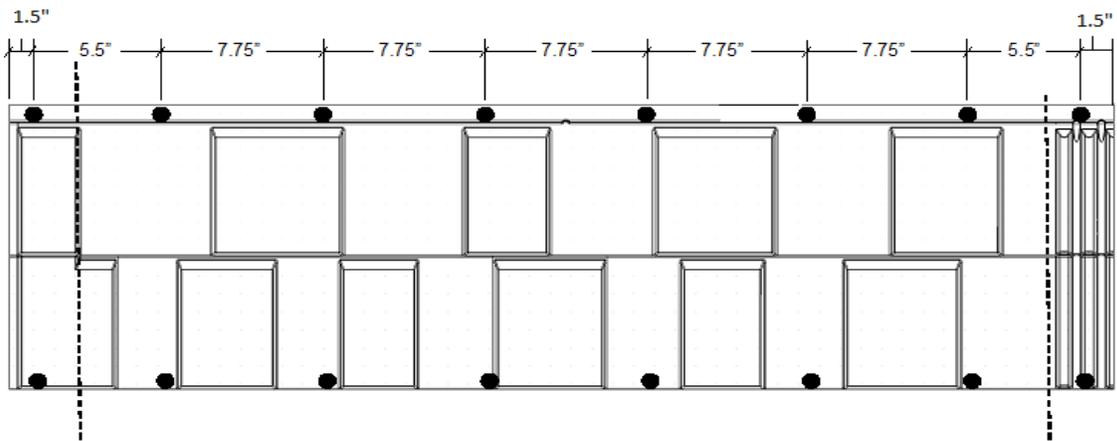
Terrabella Shingle® Panels Fastened To Wood Deck
